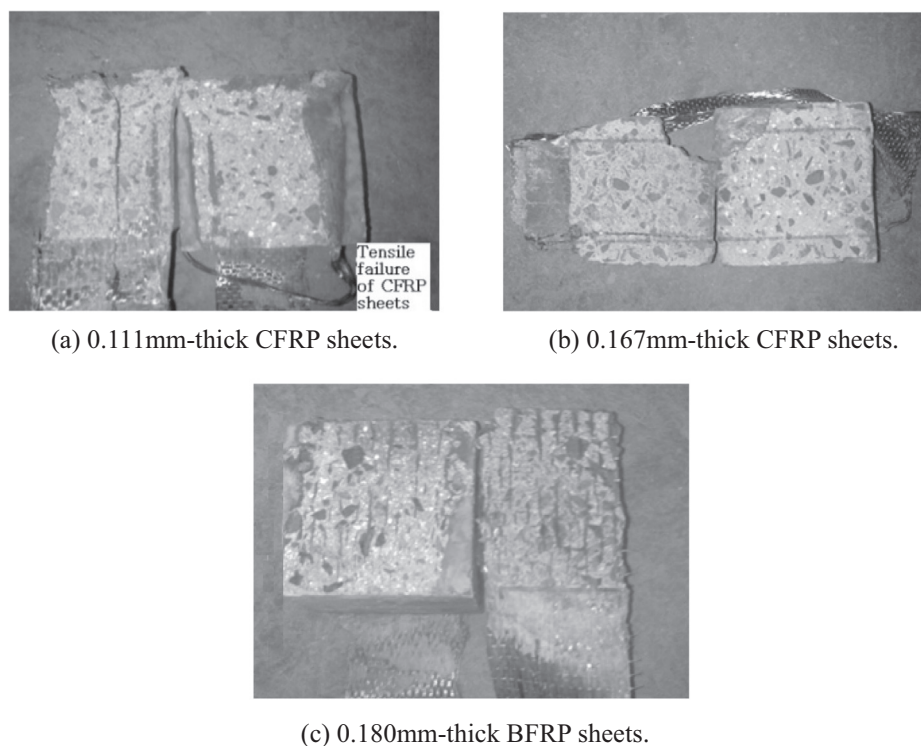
The failure situations of the concrete specimens enhanced with each of the three FRP sheets bonded with AASC.
